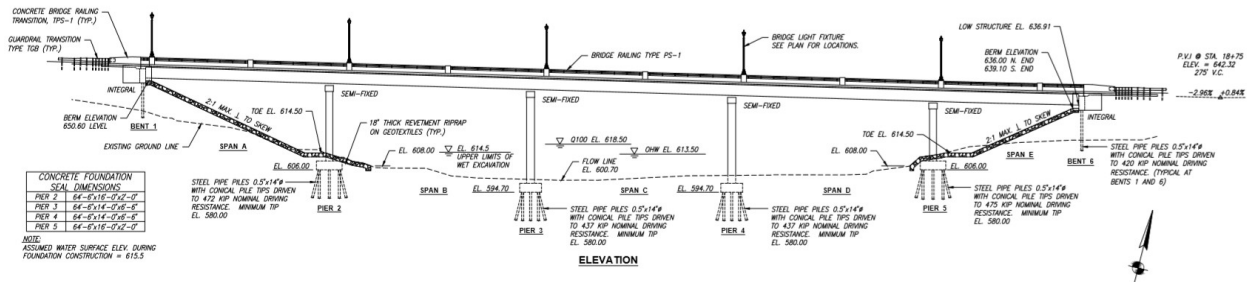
Elevation View of Bridge NBI 5941 (2014)
